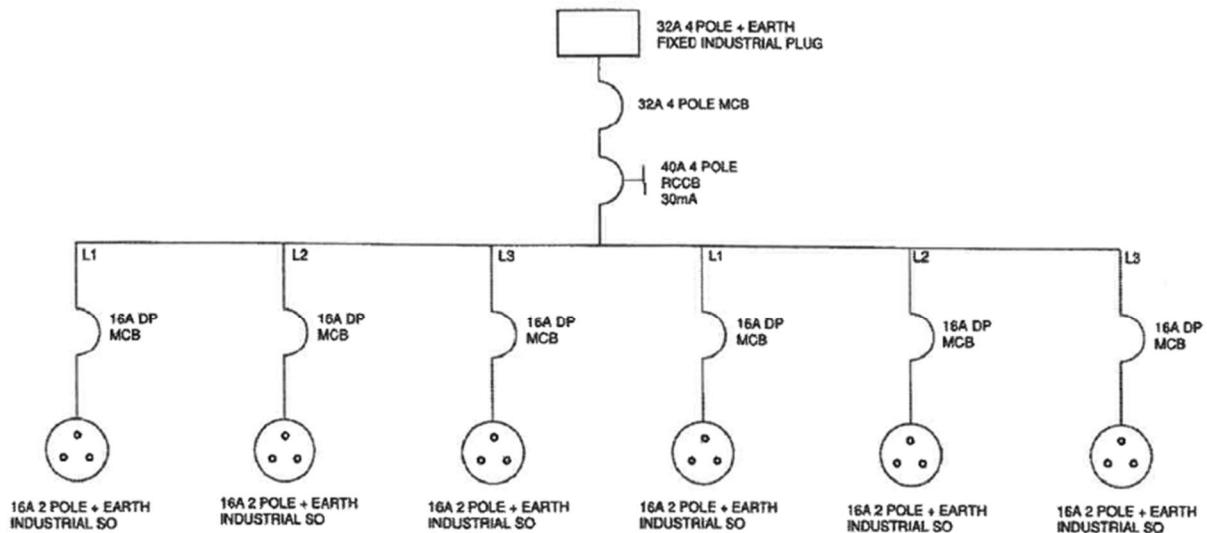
Example of single-phase socket-outlet assembly fed from three-phase source
